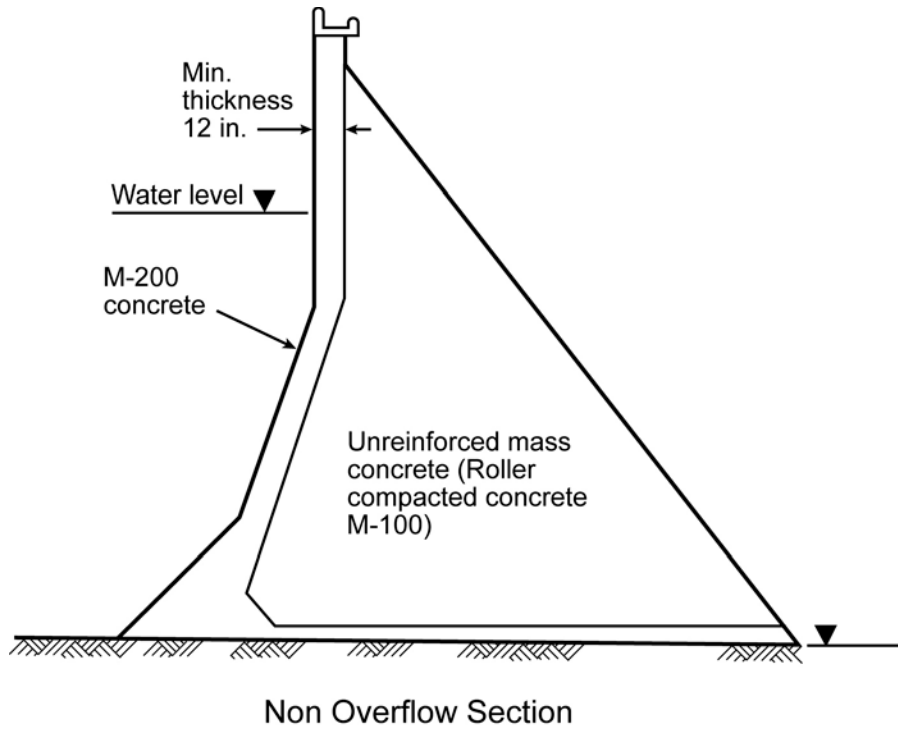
Schematic of Typical Section of a Concrete Gravity Dam (AHEC-IITR 2013)
